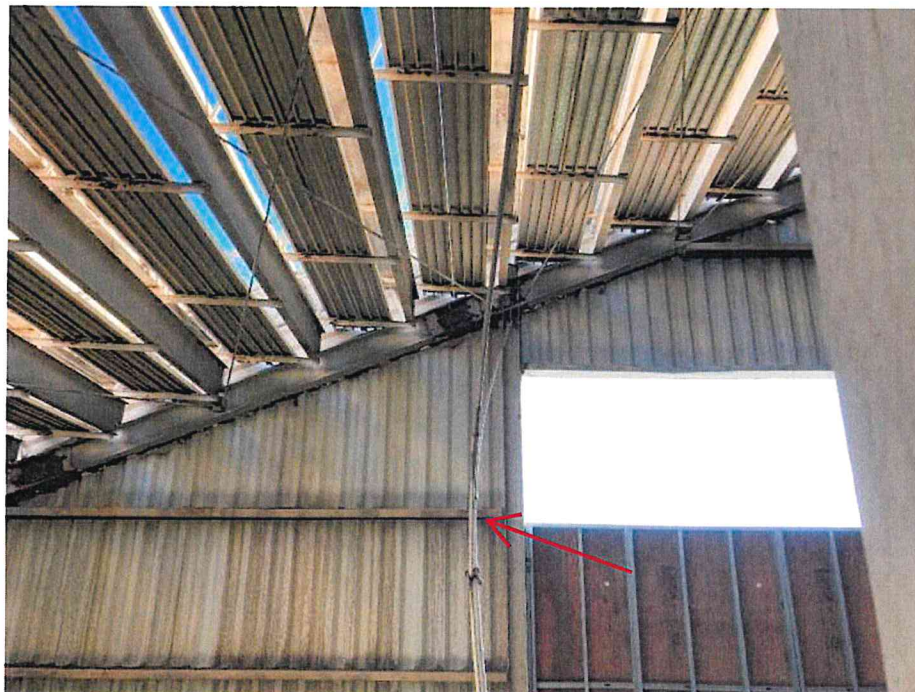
Close-up photo showing bent/damaged cross-bracing rods
